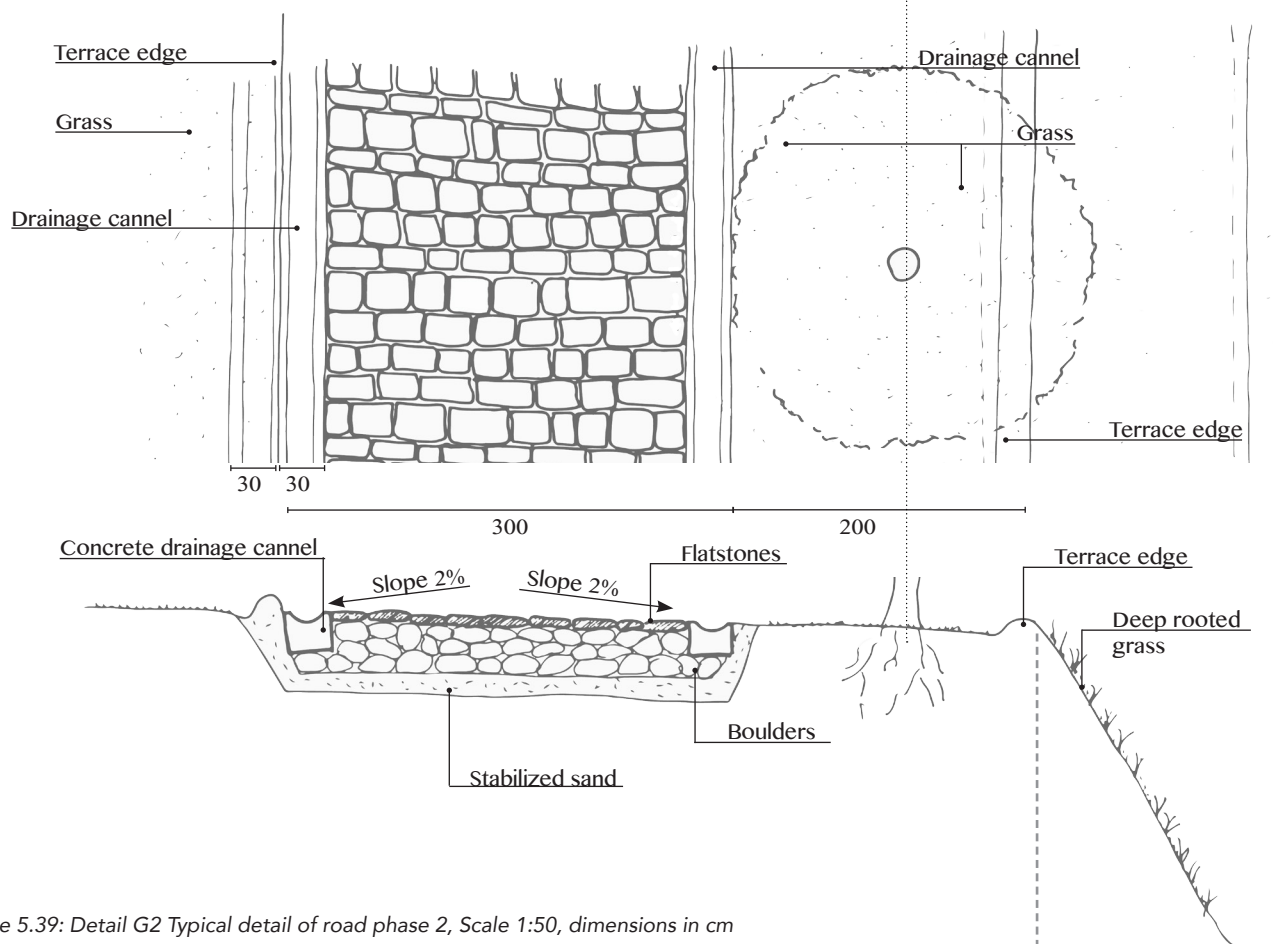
Detail G2 Typical detail of road phase 2, Scale 1:50, dimensions in cm
